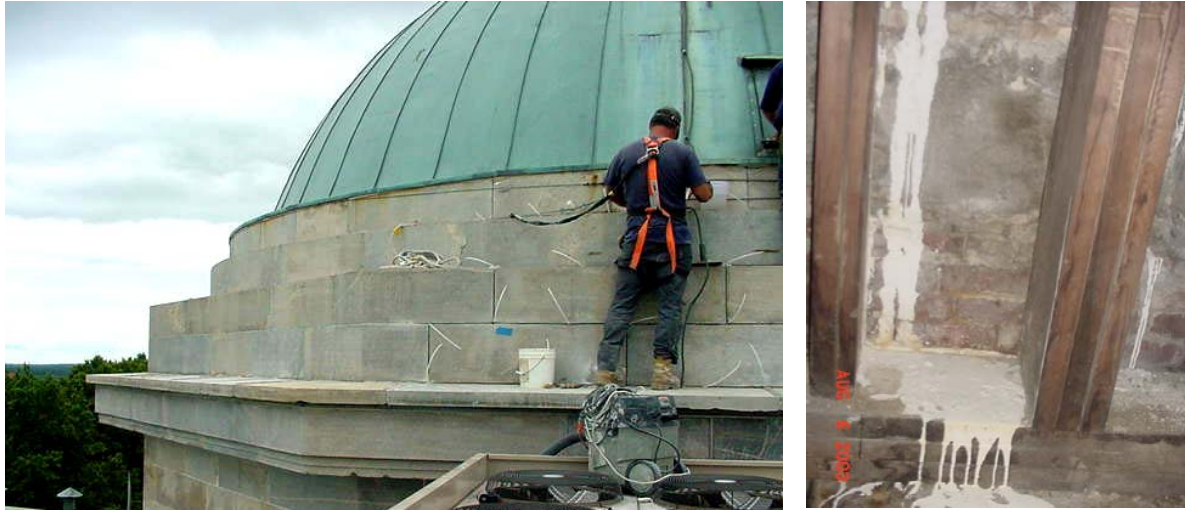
Workers prepare injection tubing for installation of lime-based grout at the North Carolina State Capitol (left). In some areas (right) the lime grout flowed all the way through the masonry to the interior surface .
